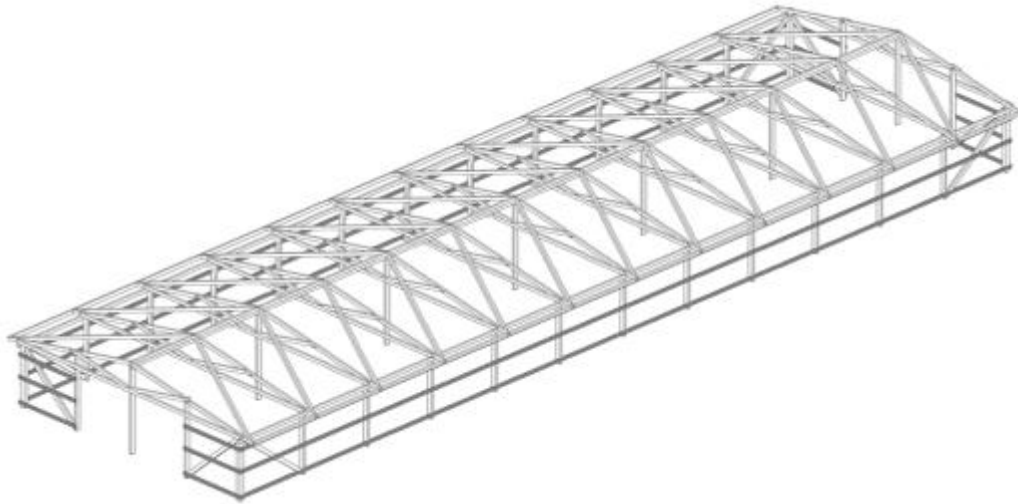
Construction detailing of plastic sheeting (Red Cross & Oxfam 2007)
